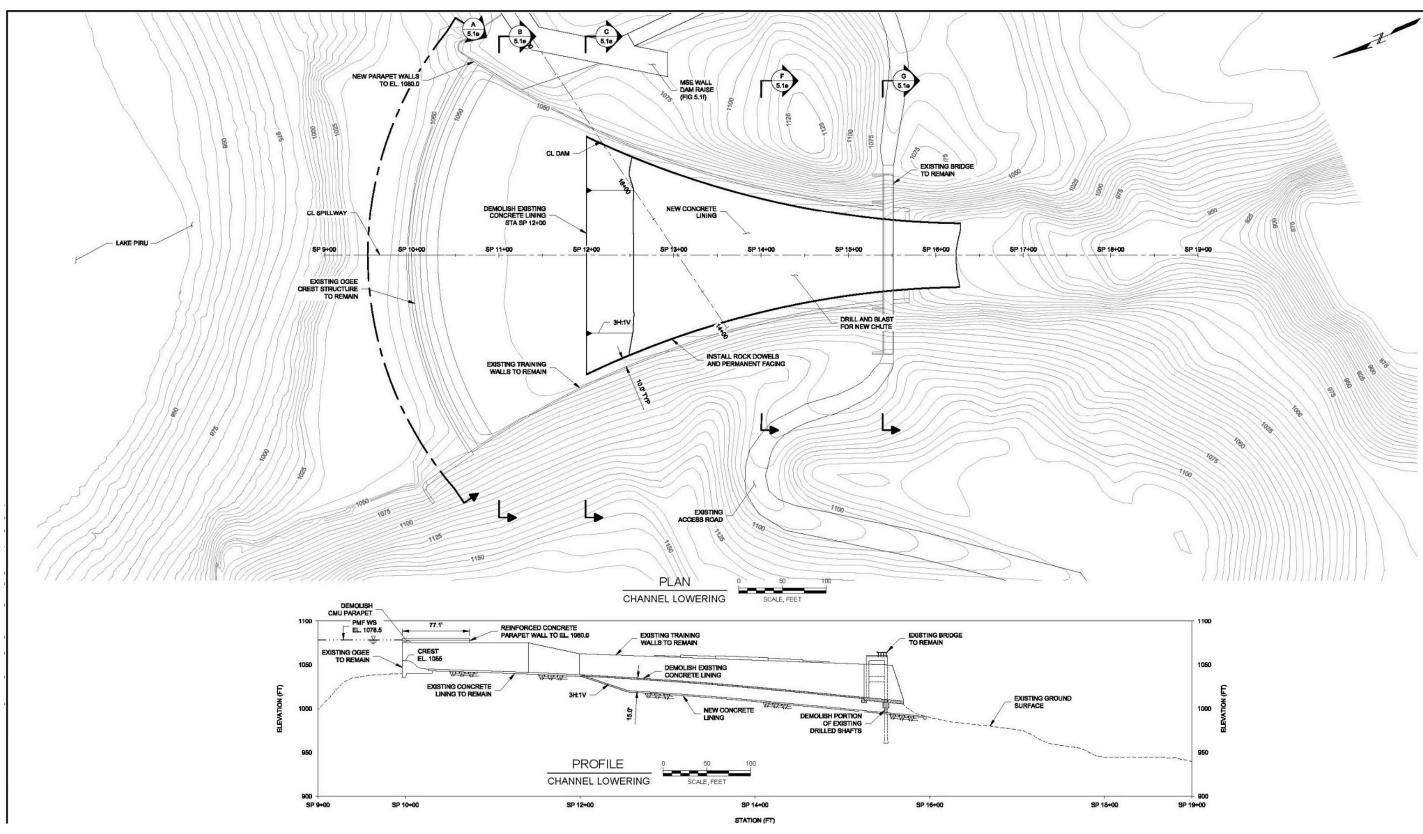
Plan and Profile Views of Spillway Channel Deepening Option
